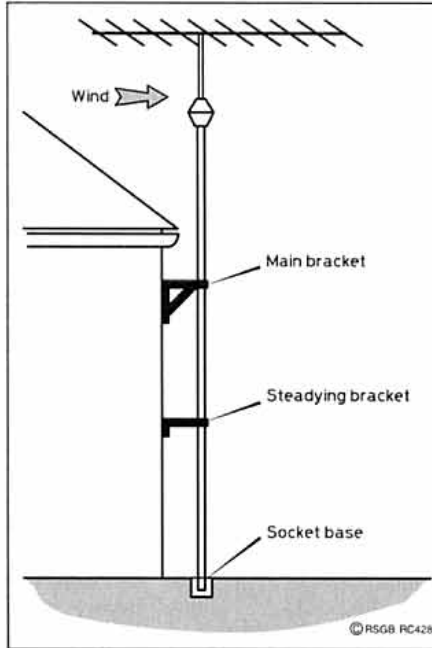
Typical arrangement of a mast bracketed to the wall of a house.
